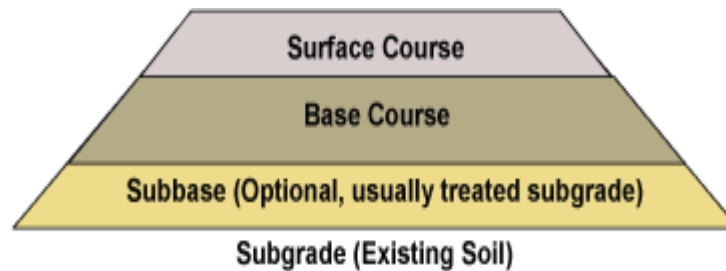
Components of a typical flexible pavement (TxDOT, 2011)
